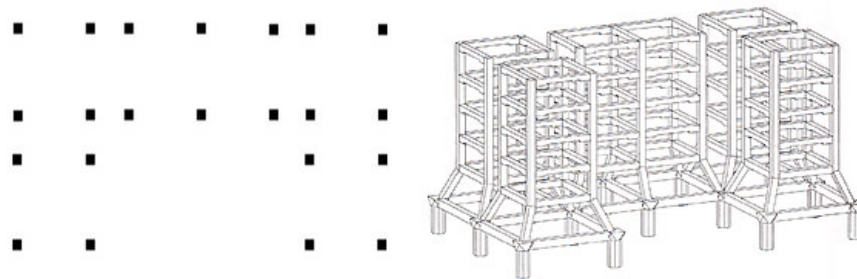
Next 21 Building structure: left-plan of load bearing concrete skeleton; right: axonometric view
